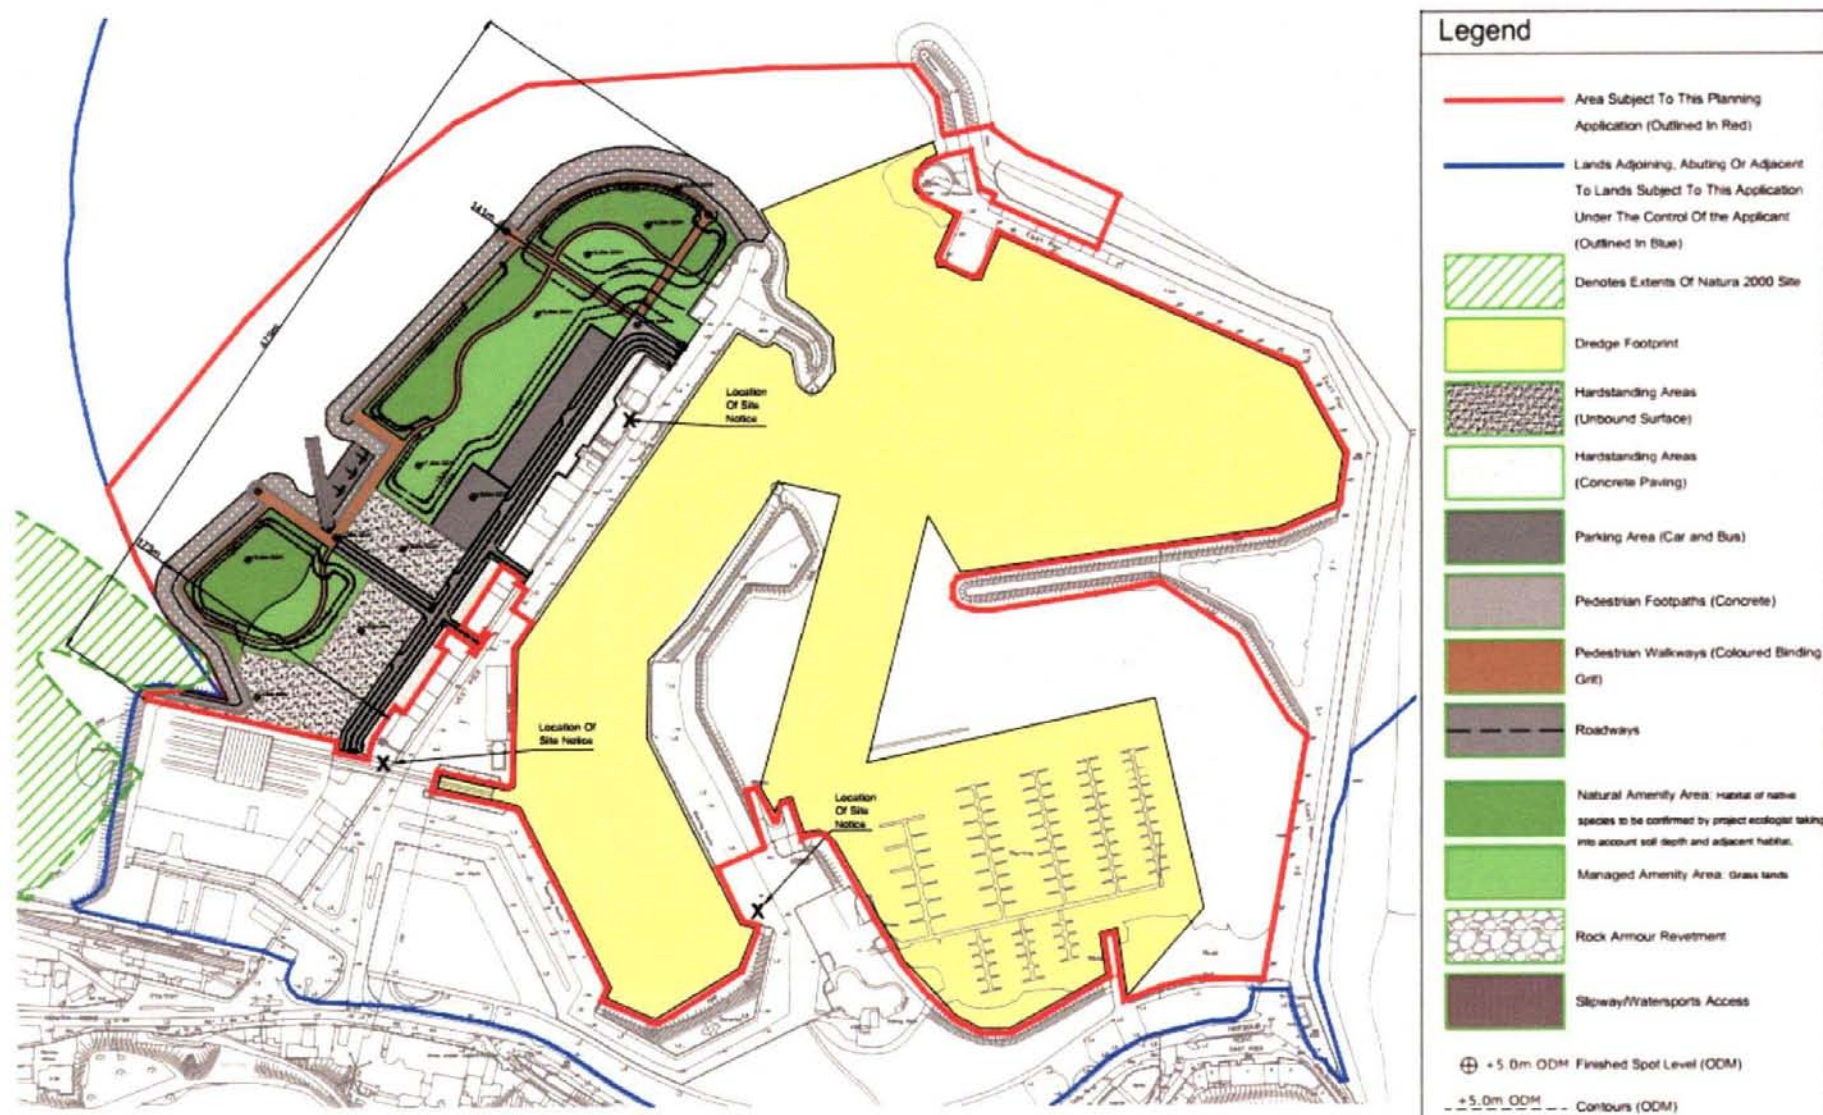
Proposed site layout with red line boundary of proposed construction works
